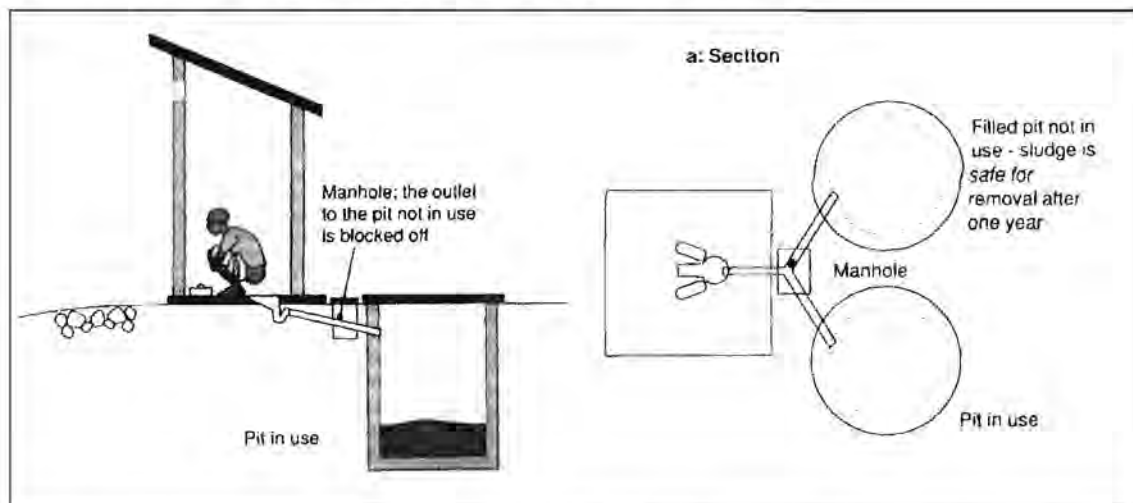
A pour-flush latrine in section and plan showing off-set, dual pits (Source: Cotton and Tayler, 2000:4.90)
